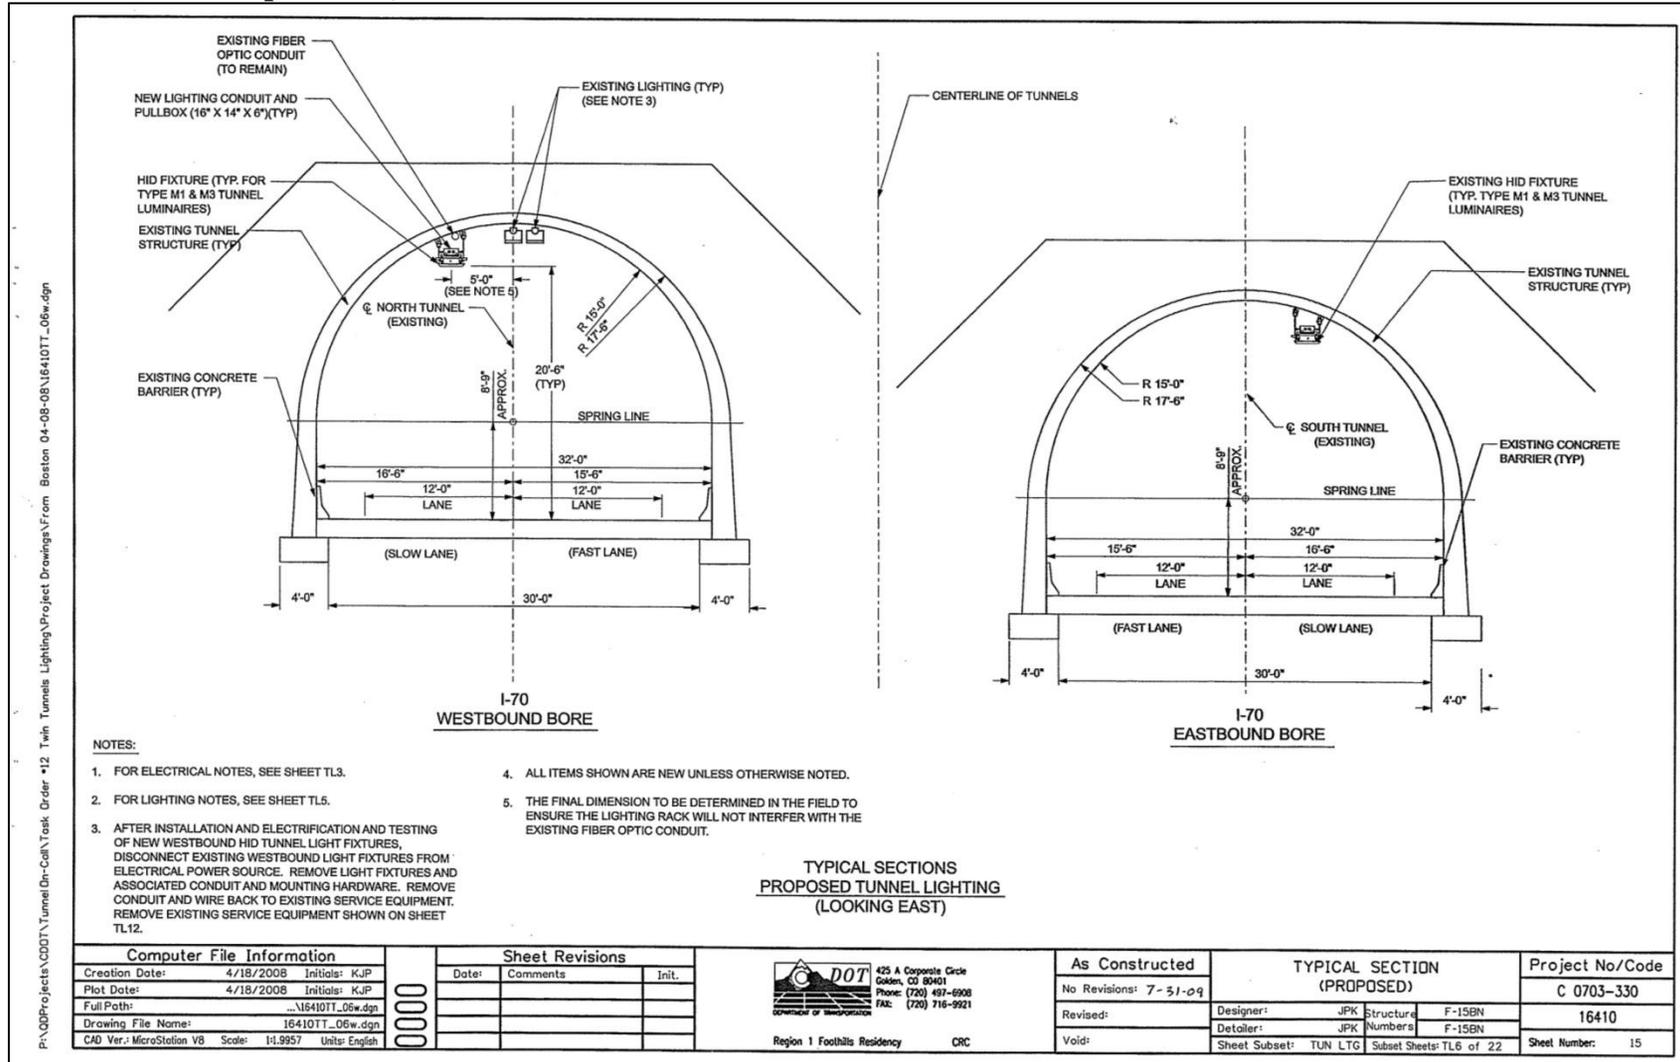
Twin Tunnels Lighting Upgrade As Built Plans (Sheet 15). Typical tunnel sections and proposed lighting, 2008.
